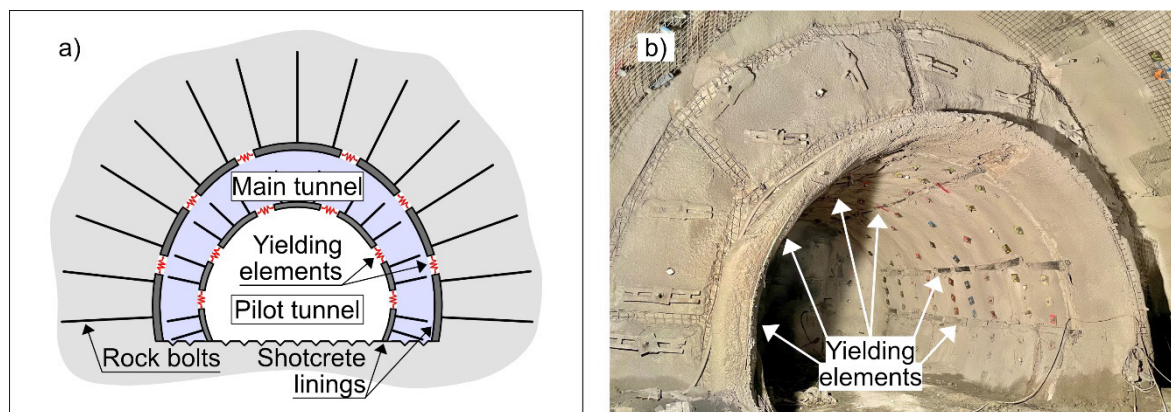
a) Schematic illustration of a pilot- and main tunnel with ductile shotcrete linings with yielding elements; b) Example of a pilot tunnel with 6 rows HS-EPS yielding elements; (Photo: Entfellner, 2023).
